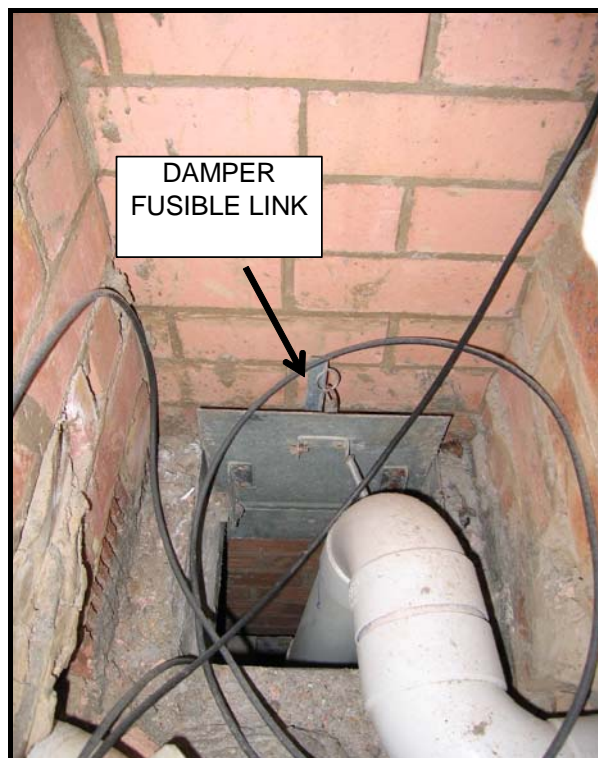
From the same project as Figure 9 but this time looking down through the masonry duct through the floor slab to the levels below; with the steel flap damper, normally held open by a fusible link now disconnected but useless anyway.
